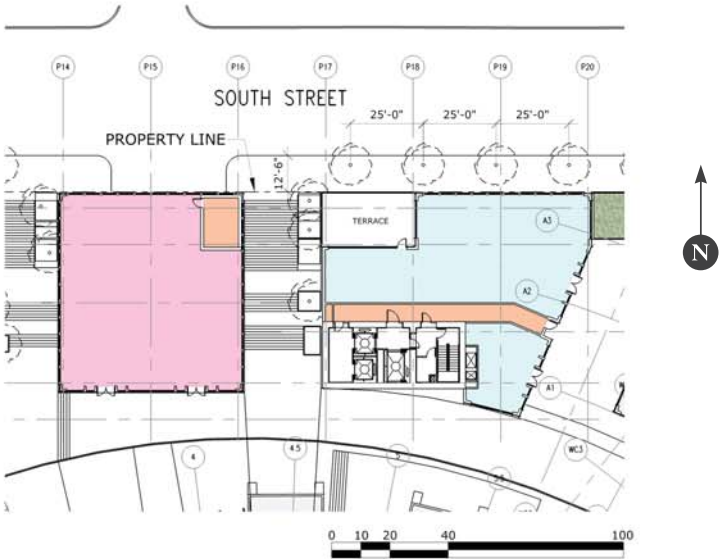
| SOUTH ST RETAIL LEVEL 200 PLAN
